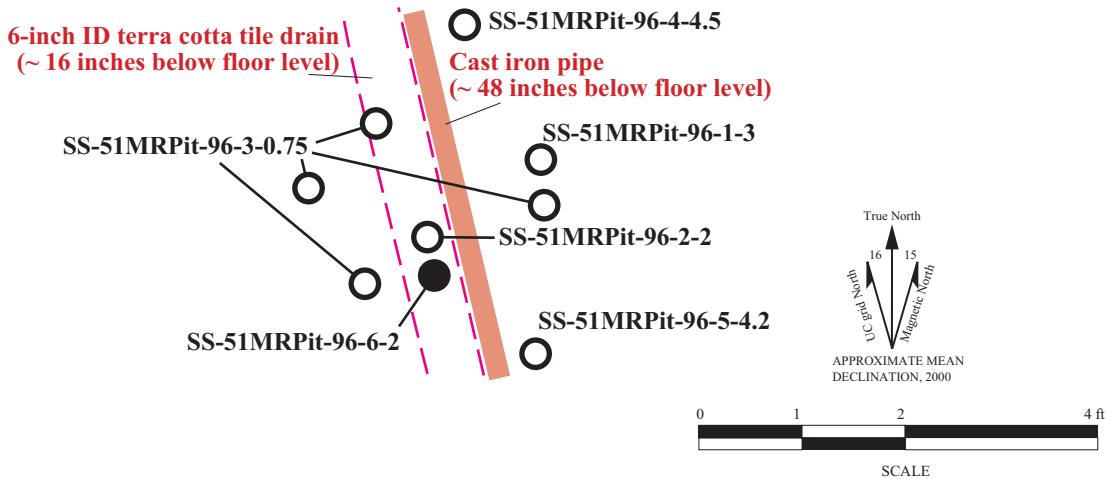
Plan View of Building 51 Motor Generator Room Basement Showing Locations of Soil Borings and Test Pits.
